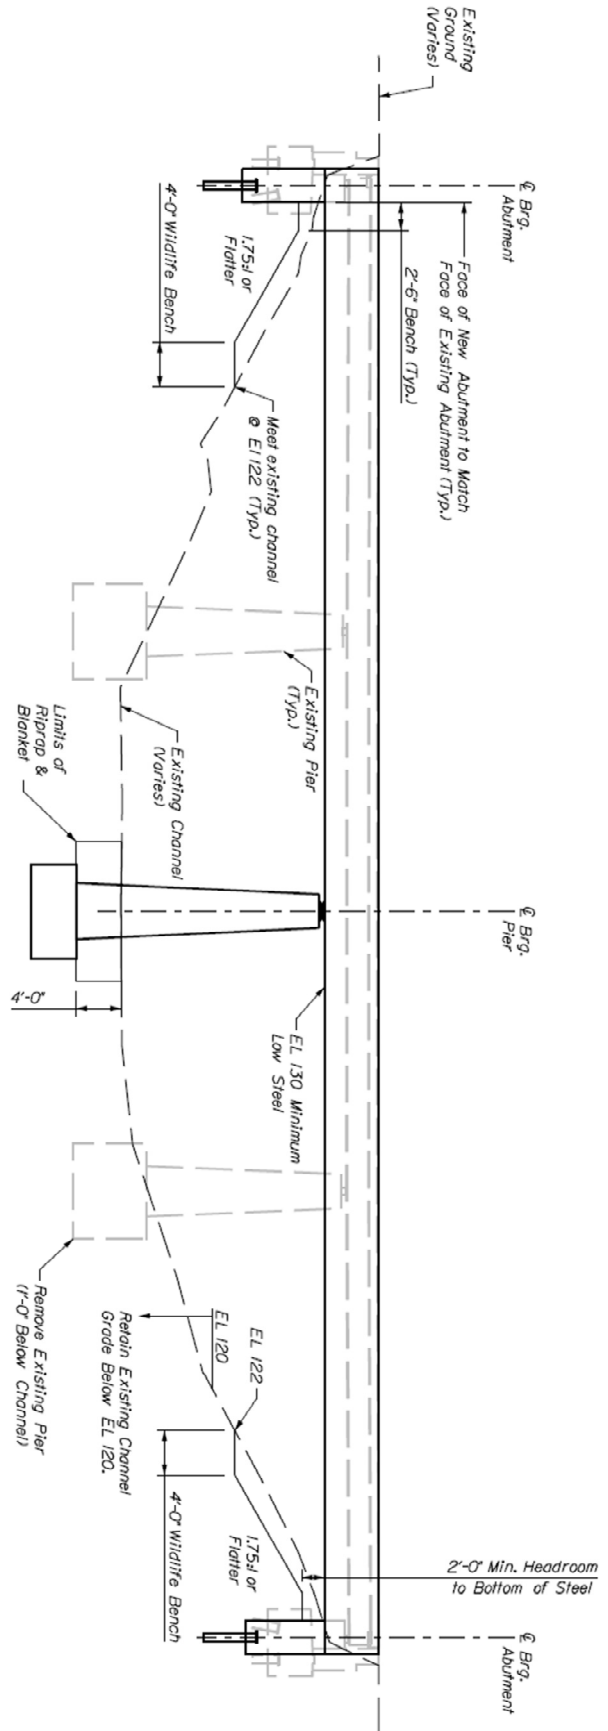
ASSUMED BRIDGE ELEVATION SCHEMATIC
